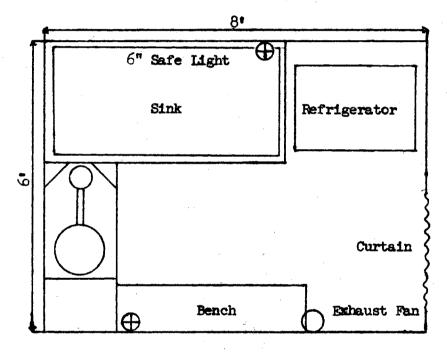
DARKROOM FLOOR PLAN SEMINOLE DAILY PRODUCER
